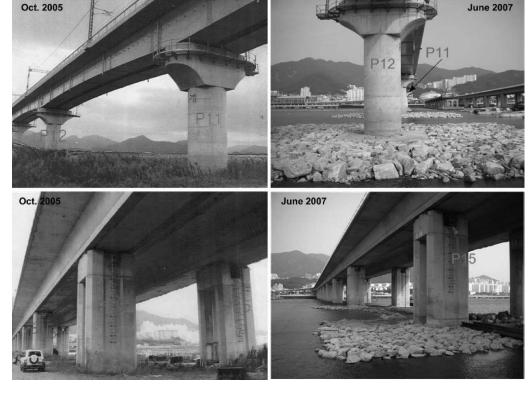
Gupo and subway bridges' piers before and after retrofitting construction
